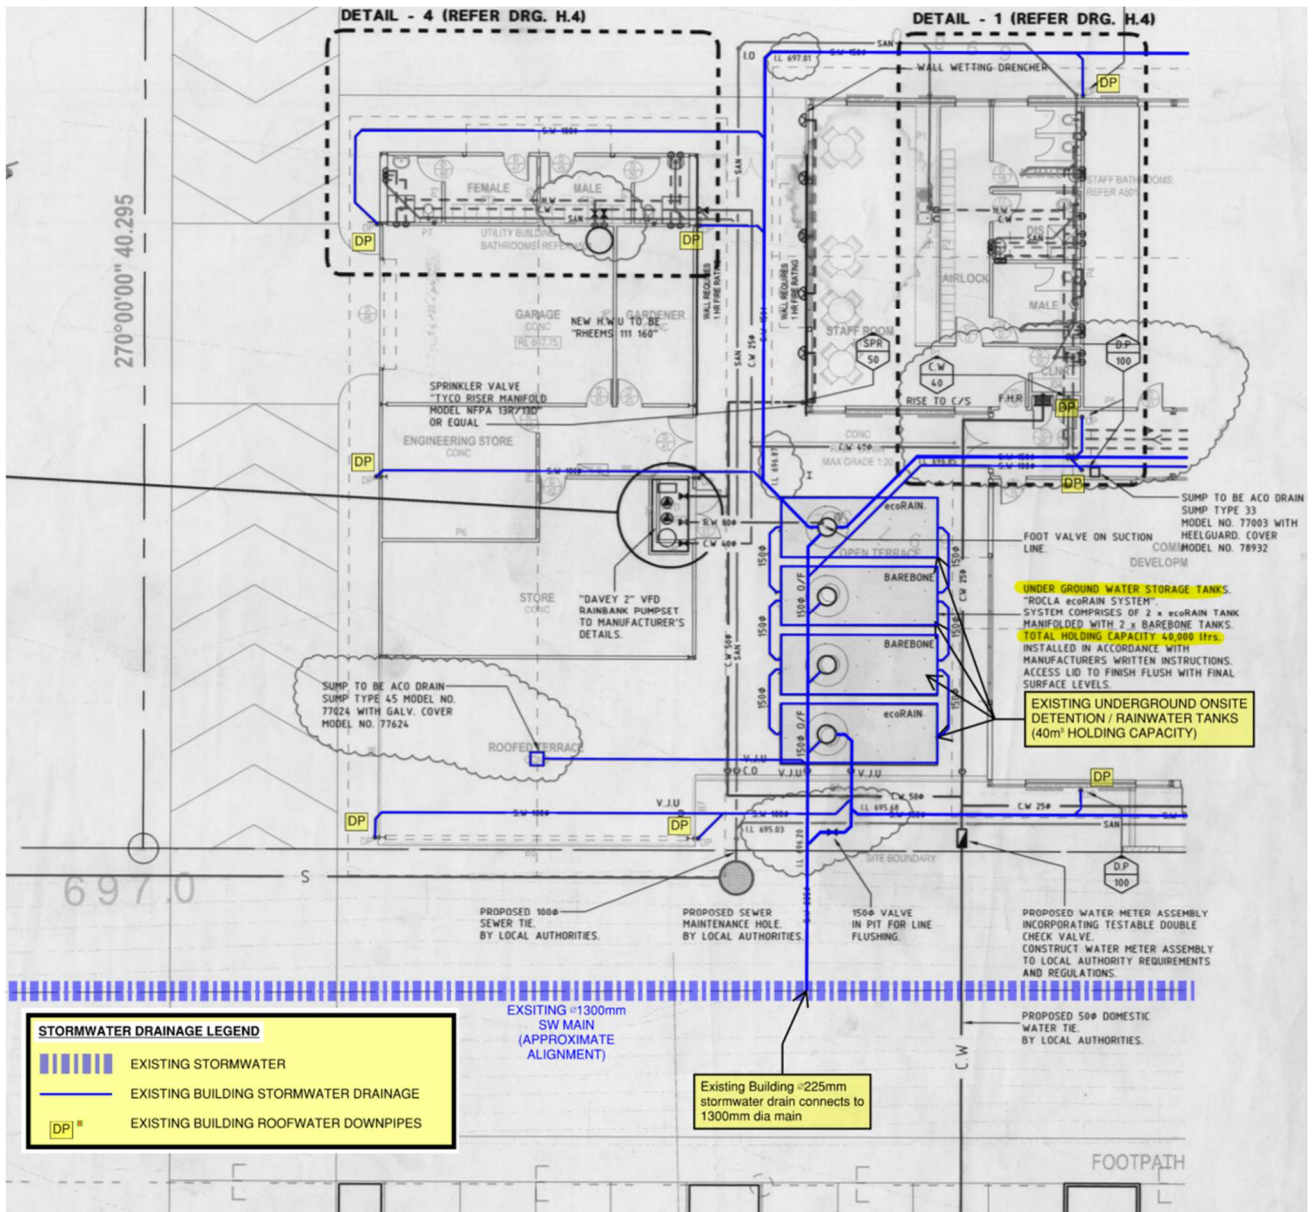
Existing Building Drainage (Source: Northrop Consulting Engineers drawing 'Ground Floor Plan North – Hydraulic Services', 2006)
